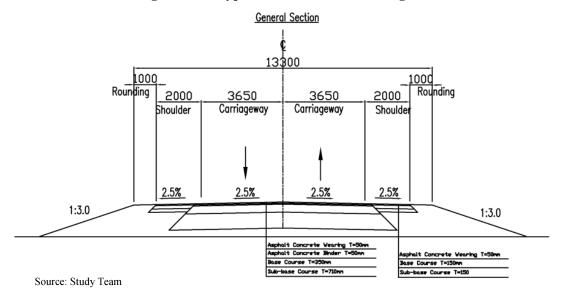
Typical Cross-section for Ordinary Section of Asutsuare-Aveyime Road
